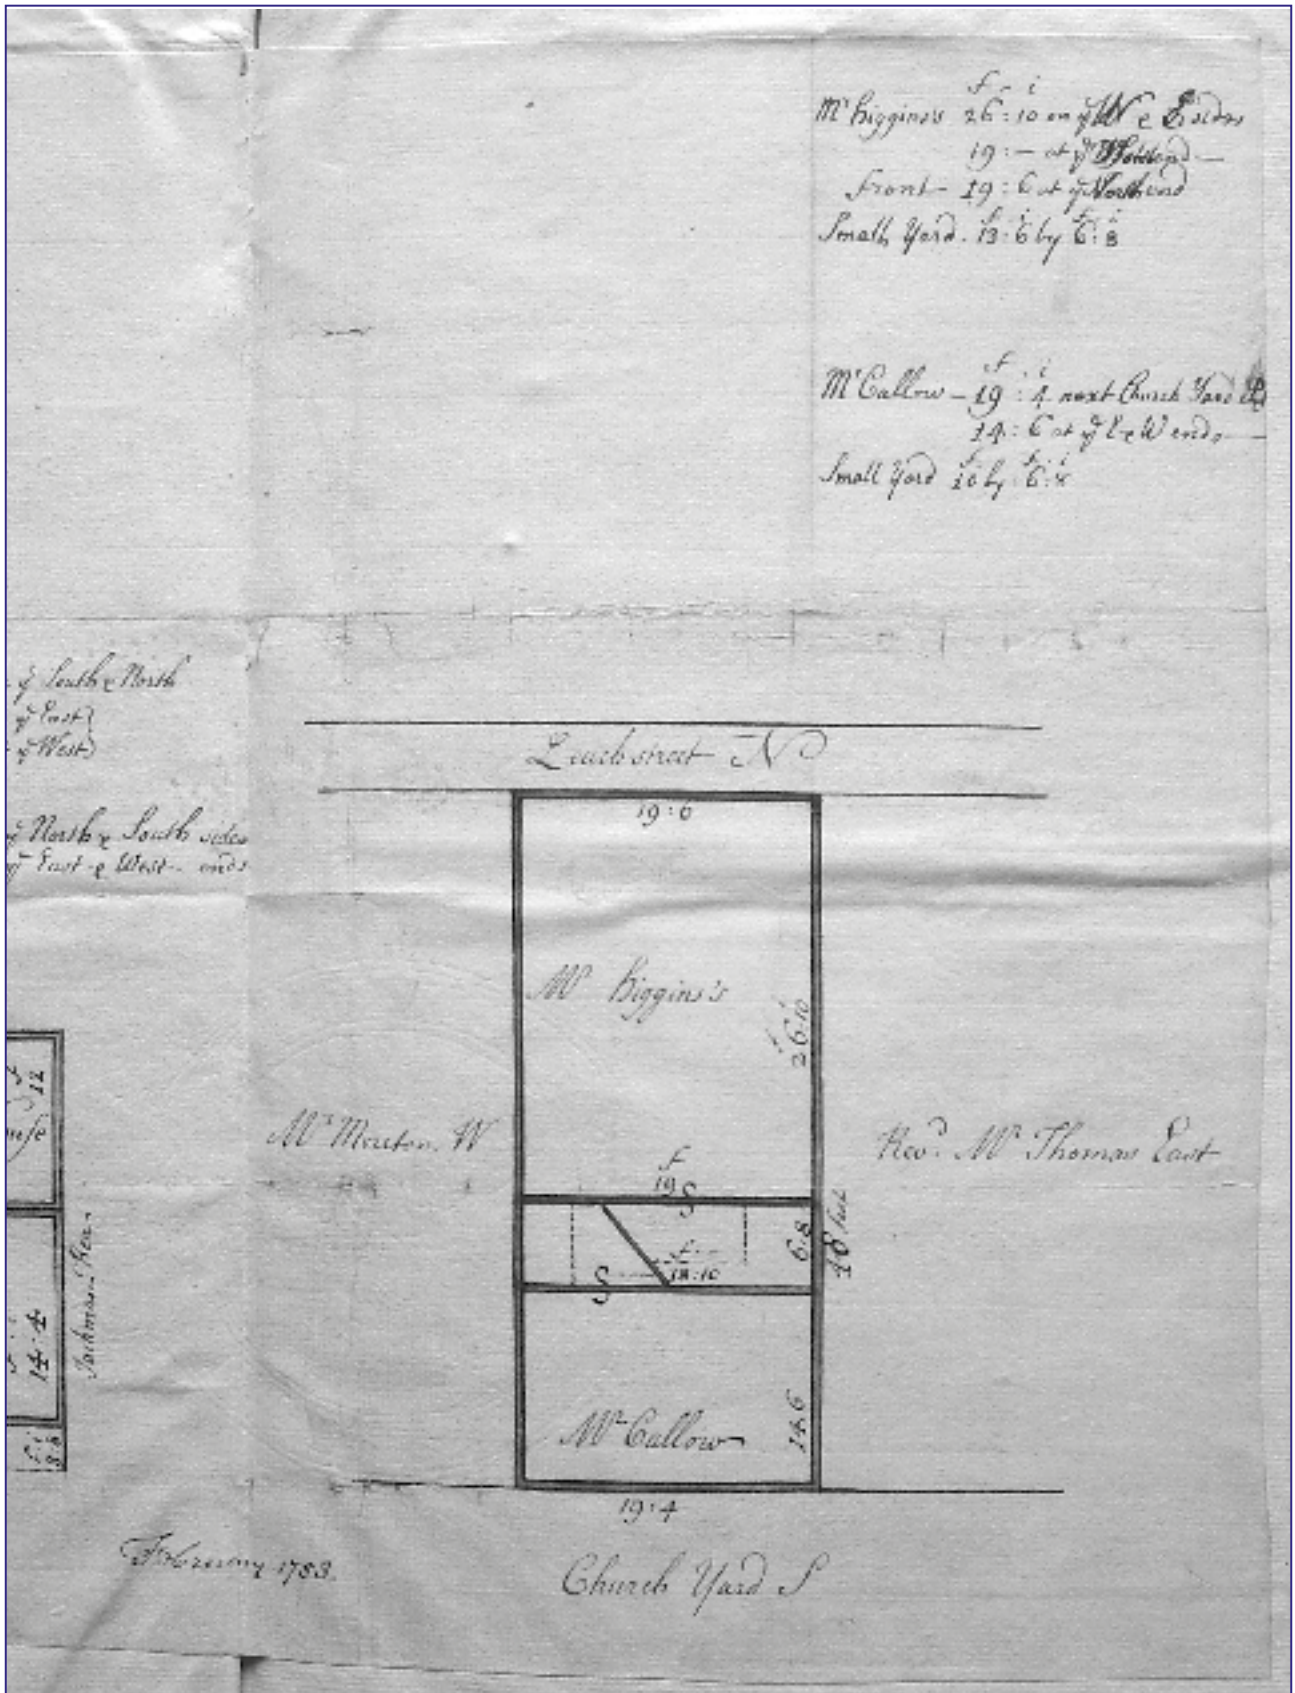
No. 4 Lich Street in 1753; showing the building divided into two dwellings separated by a yard and the named tenants on either side.
